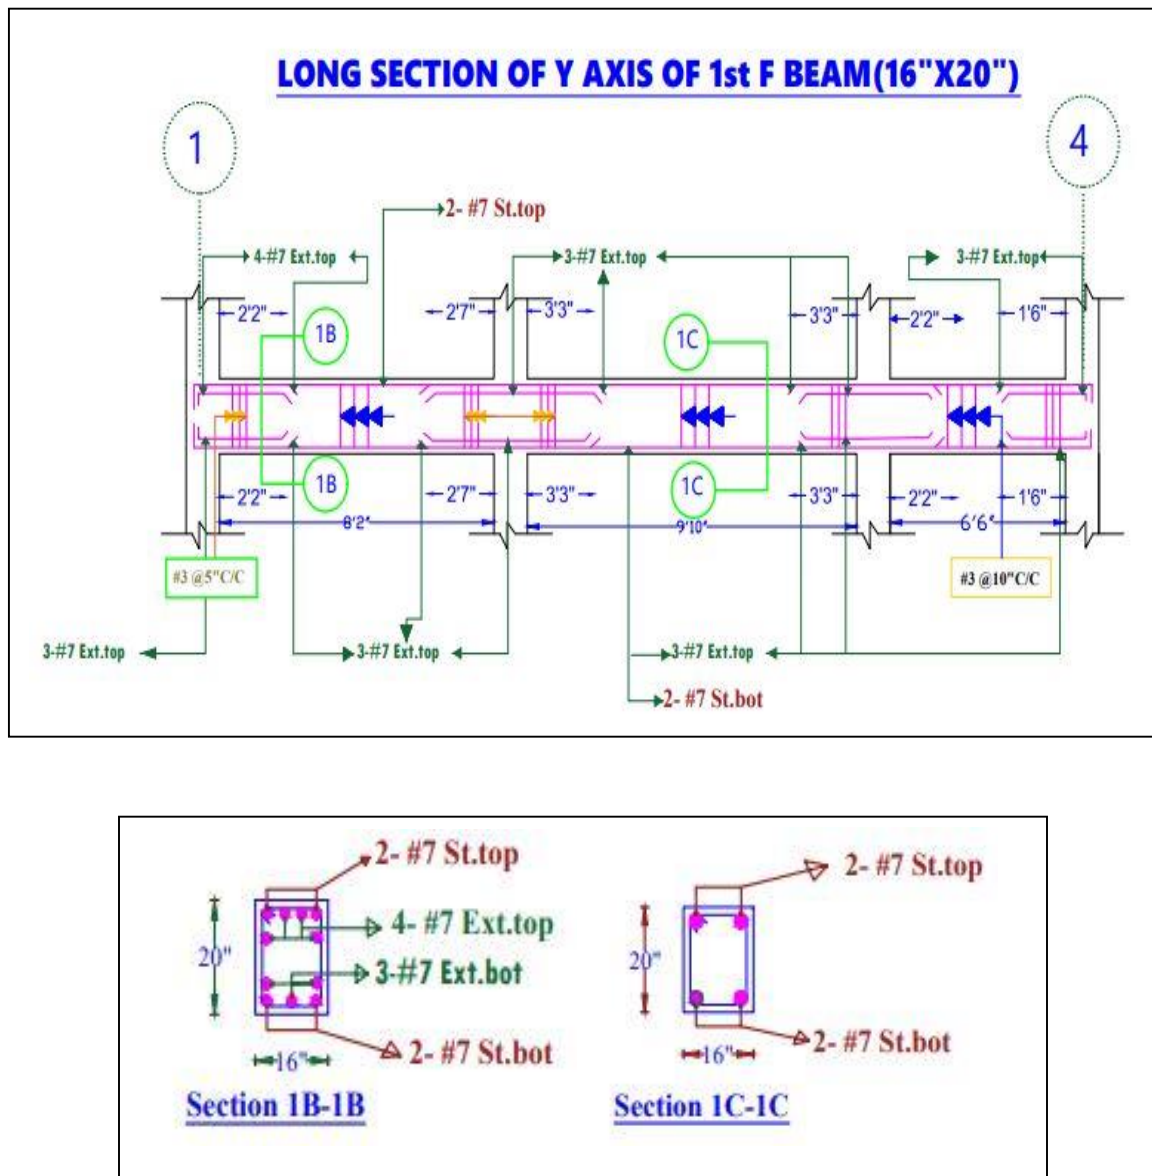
Beam Detailing & Cross Section of Y-axis
